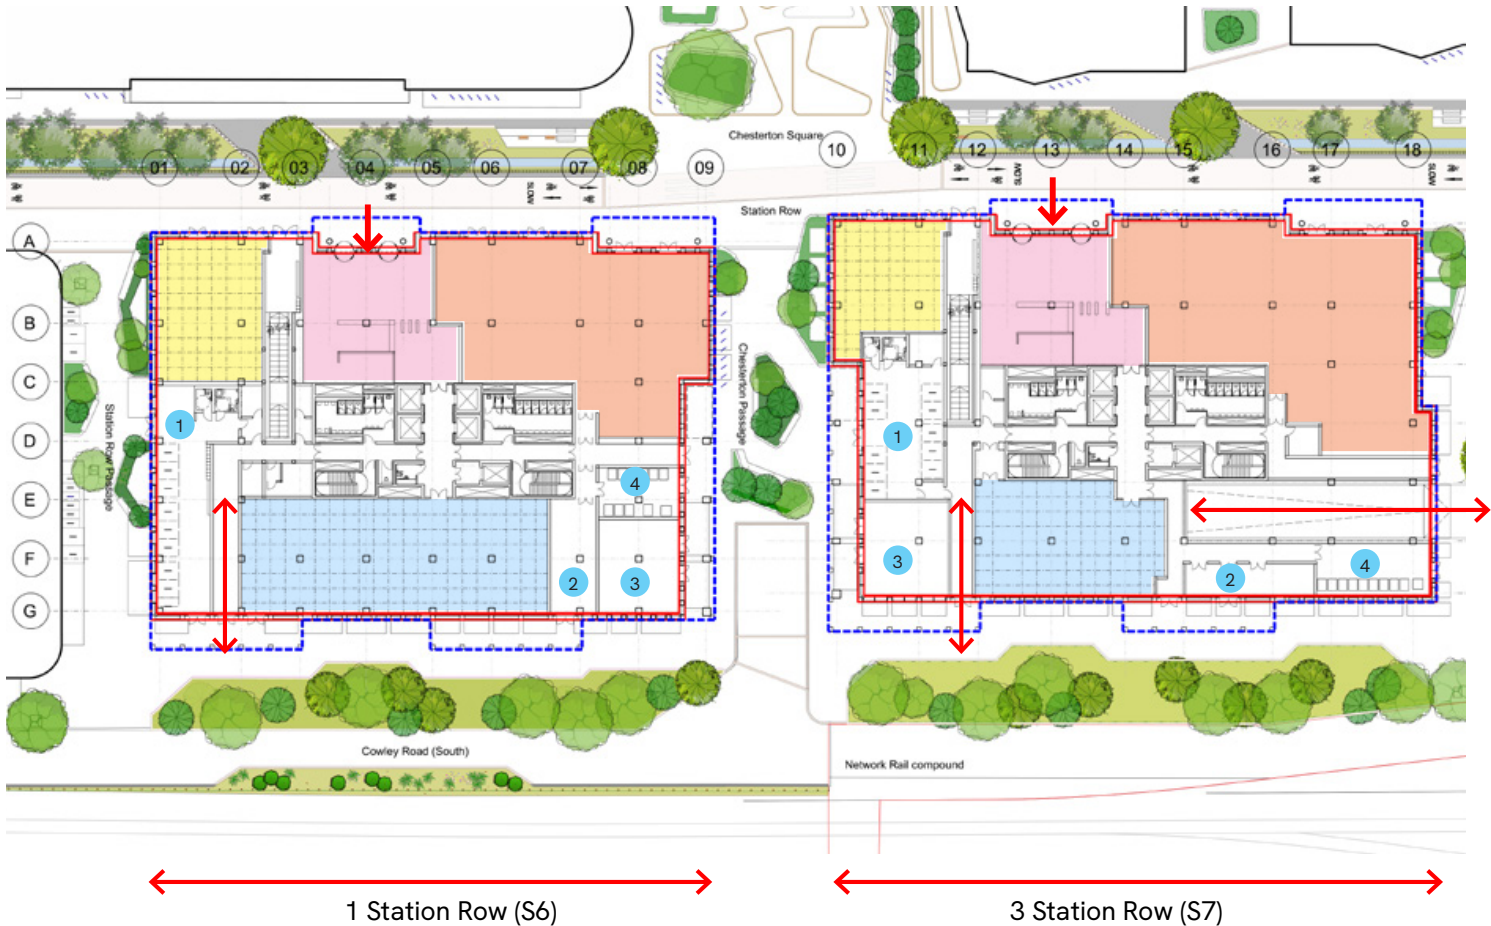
S6&S7 Ground floor plan (CD2.75).
